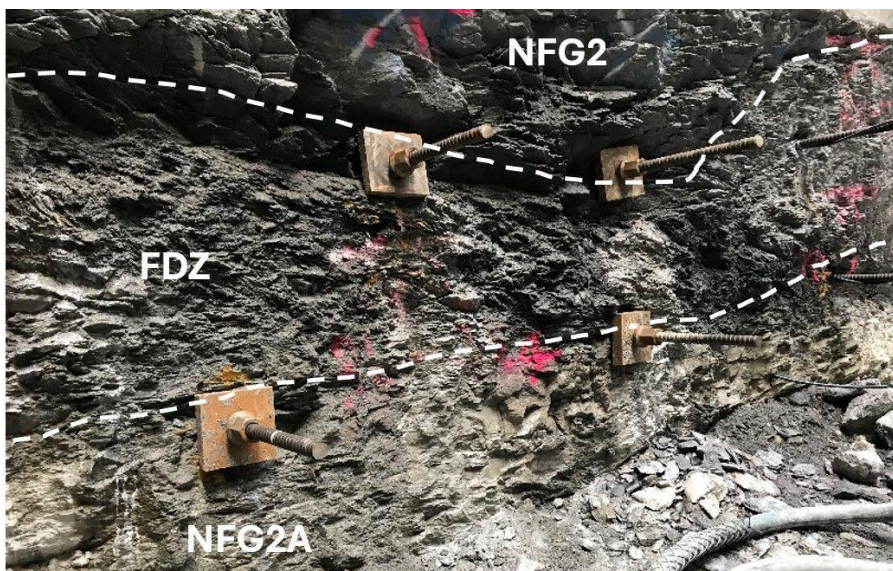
Pillar stitch bolts in low-angle fault at Albert Street Station.
